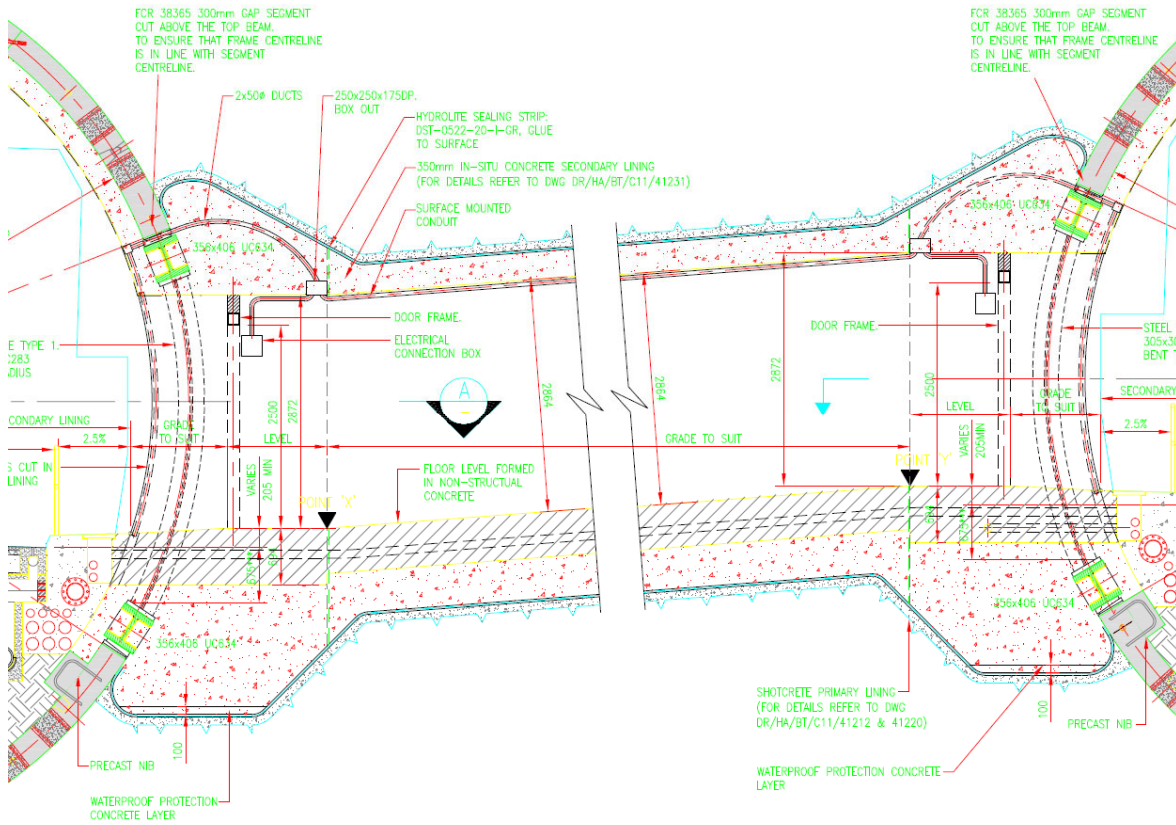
Cross Passage Design Details (as-built drawing No. DR/HA/BH/C11/41061/05/X)
